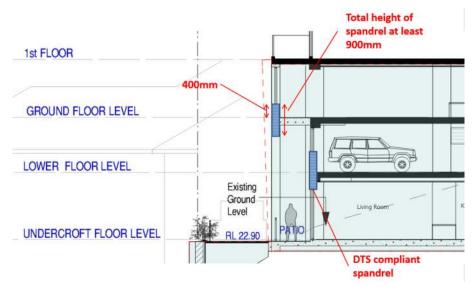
Location of the proposed spandrel that is 400 mm above the slab level of the ground level (south / rear elevation shown)
